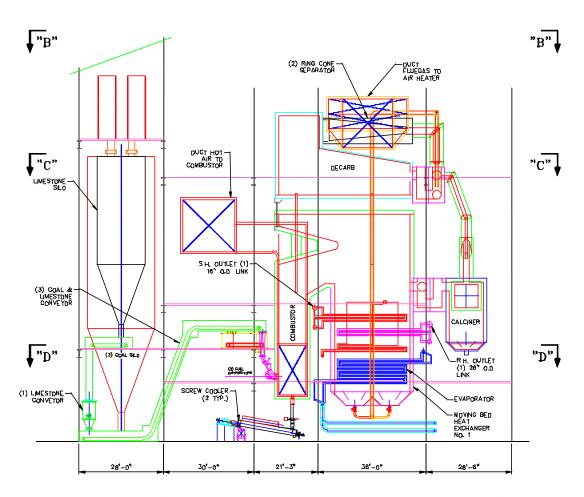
2: Case-5 Boiler Island General Arrangement Drawing – Side Elevation
